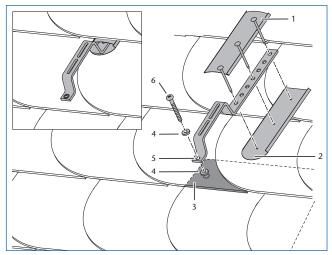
/2 shows an example of a waterproof installation of the special roof hooks (item $5 \rightarrow 90/2$) on a slate or shingle cover with seals and flashing to be provided on site.
